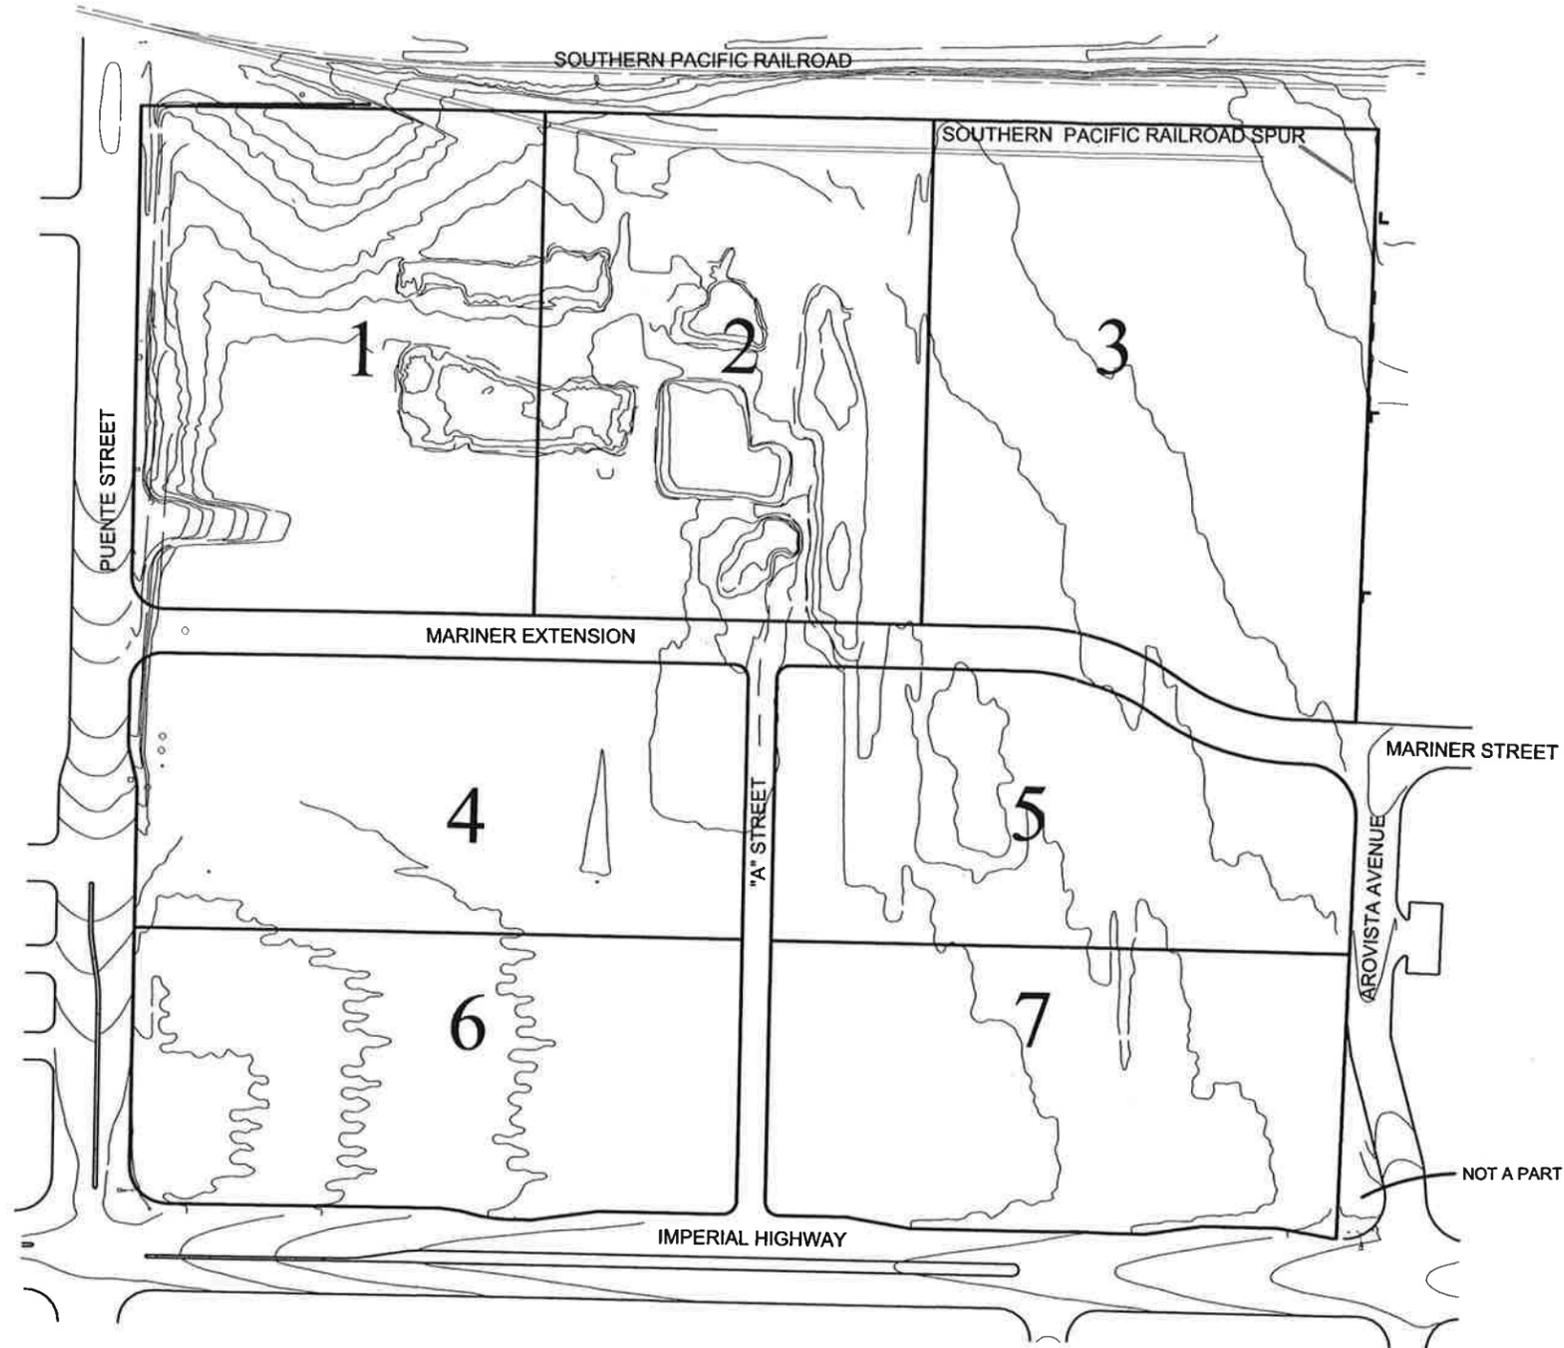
depicts the Conceptual Grading Plan for the Brea Industrial Specific Plan area located north of Imperial Highway and east of Puente Street. The Specific Plan area will not require a significant amount of grading. The site is generally flat, with fifteen feet of elevation difference from the extreme high to the extreme low point. The natural drainage of the site is to the southwest corner of the property. The intent of the Conceptual Grading Plan is to produce buildable parcels by a cutting of the higher areas to fill in the lower areas and achieve generally flat development pads for development. The proposed grading will result in ground elevations which are typically within 1 to 5 feet of the existing grade and will utilize the existing storm drain system. The building pad areas will be graded to approximately .5% with circulation and parking areas graded to an average of 2% to 3%.
